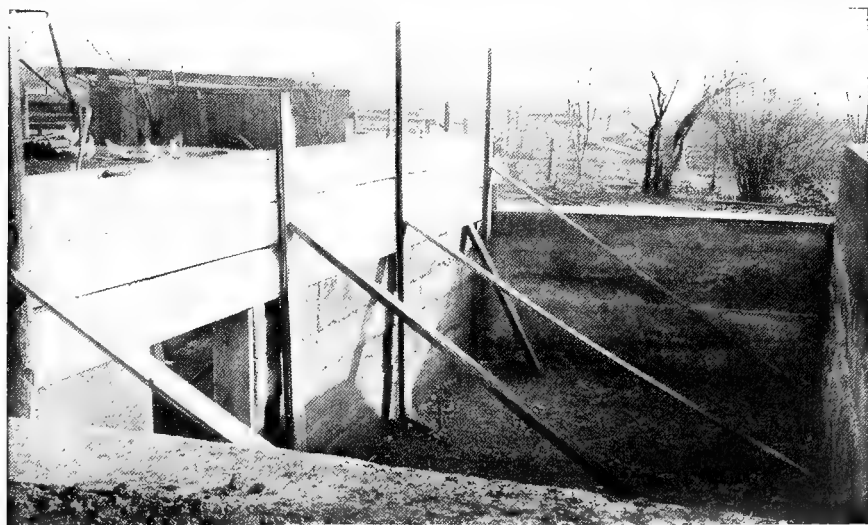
Concrete Foundation for a Farm Building, showing method of bracing forms.
